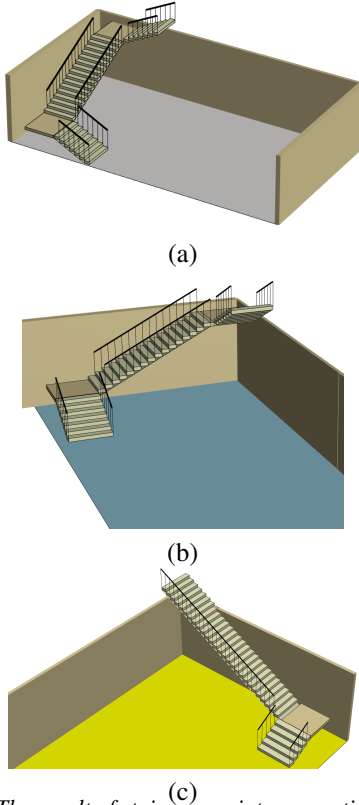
The result of staircase points separation for TUM Building 1 dataset: (a) floor-2, (b) floor-3, and (c) floor-4.
